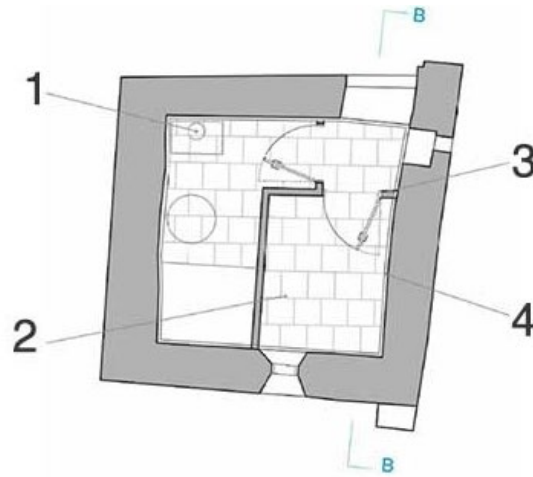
Casa Dell'affresco Detail of the works planned on the ground floor, (FoRTI, 2022)
